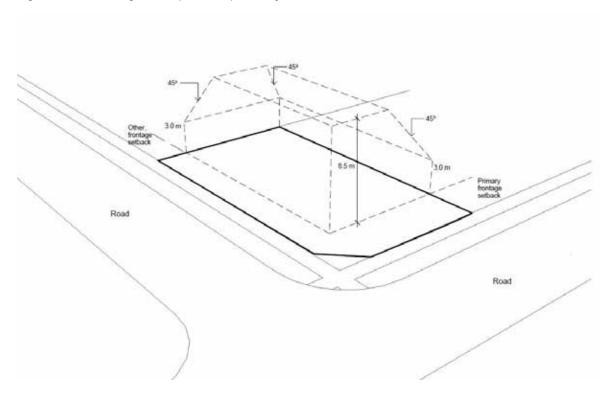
Building envelope for corner lots as required by clause 10.4.2 A3(a)
